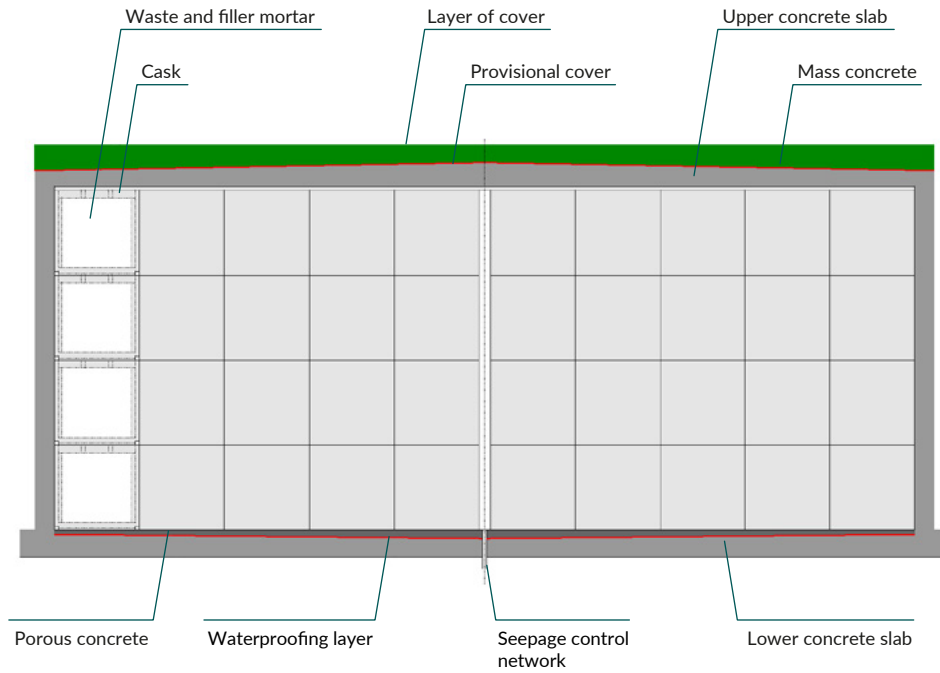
Engineered barriers at El Cabril Disposal Centre
